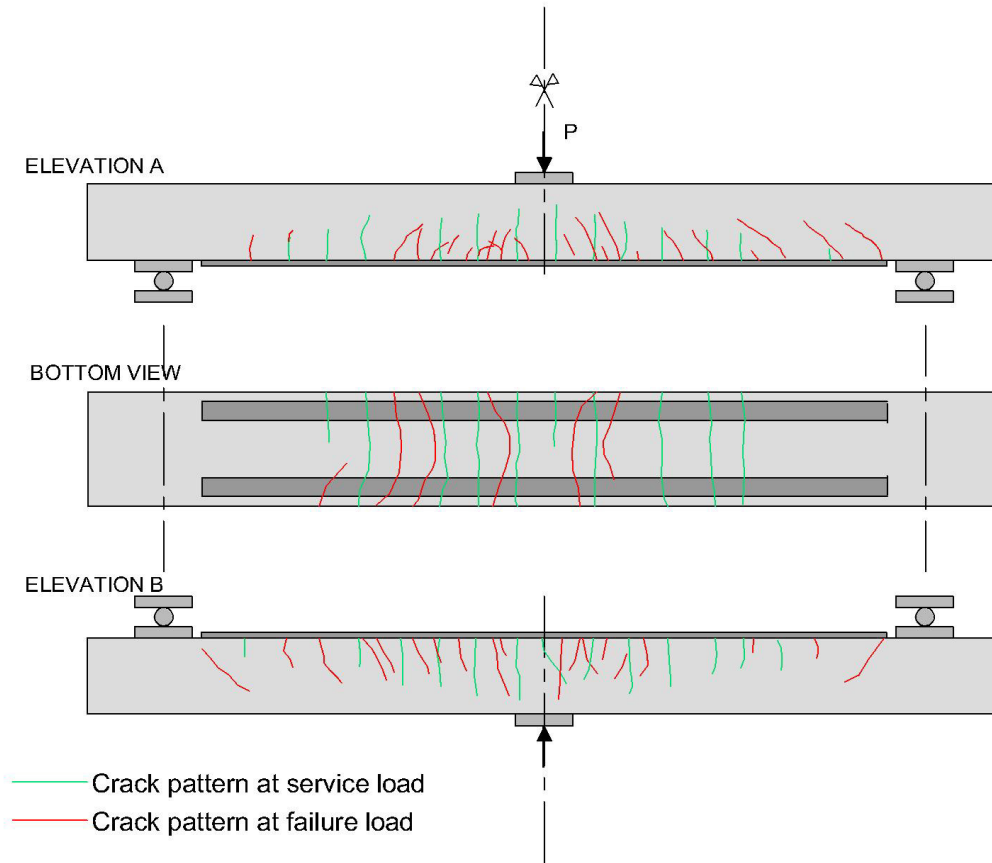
Crack pattern of Beam 2/C at failure load.
